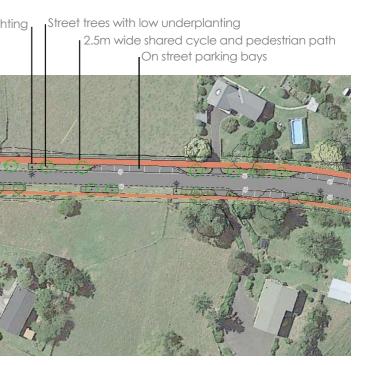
PLAN VIEW EXTRACT OF WESTON LEA DRIVE EAST
